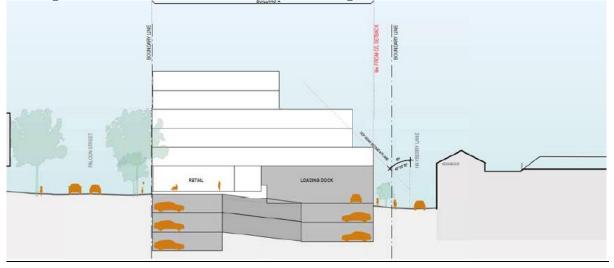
Section 'A' indicating relationship of proposed building to Hayberry Lane (looking east)
